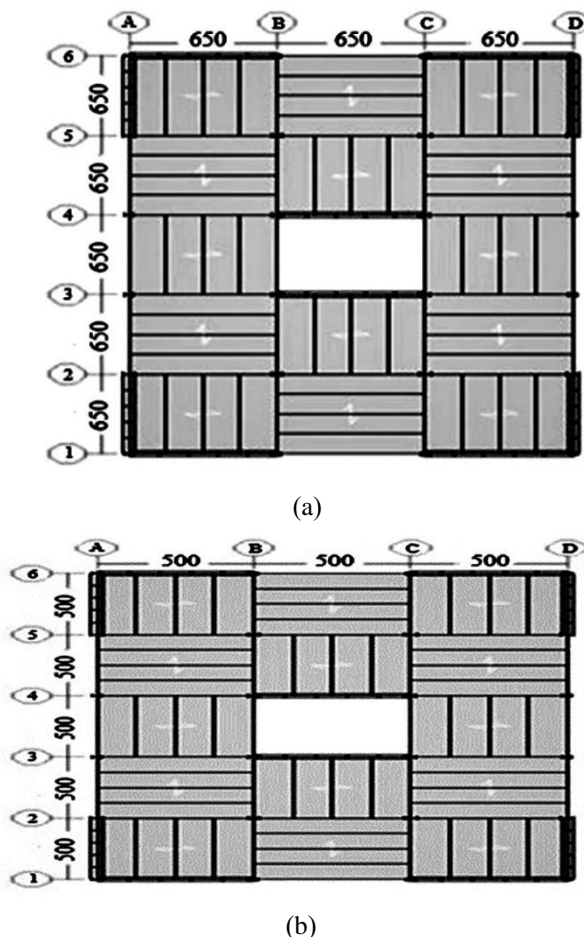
Building plan: (a) with spans 6.5m , (b) with spans 5m
